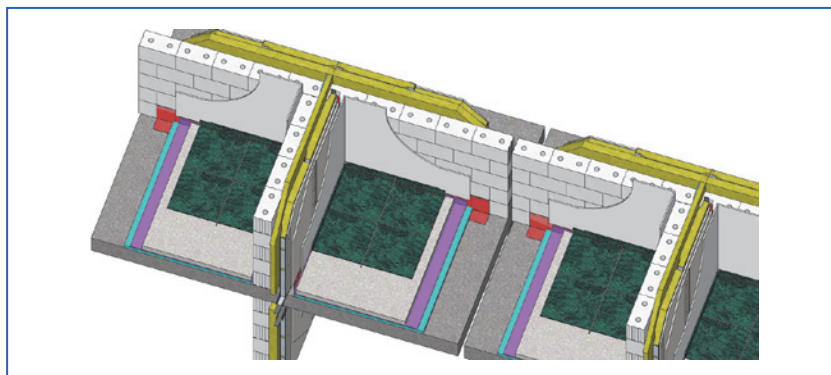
Drawing of general concept 6 with heavy single load bearing wall.
